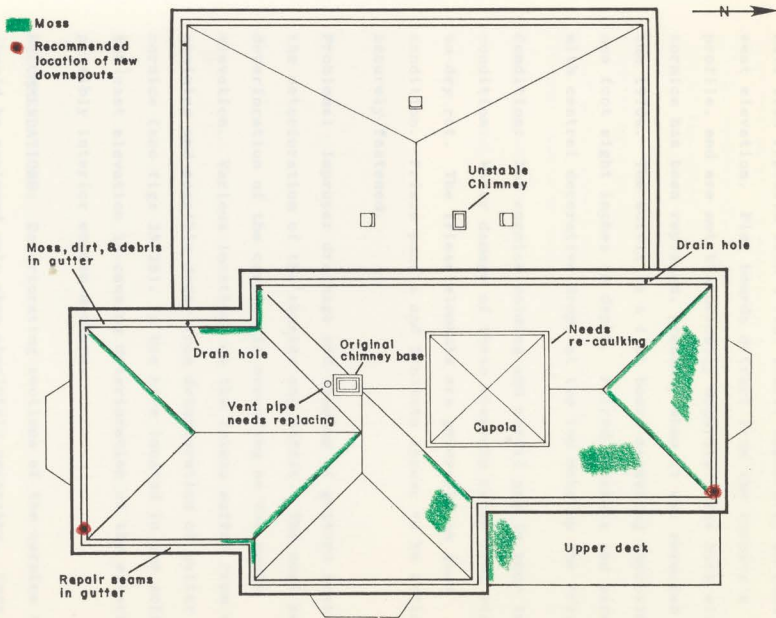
Roof plan. Areas of deterioration and recommended location of new downspouts.
